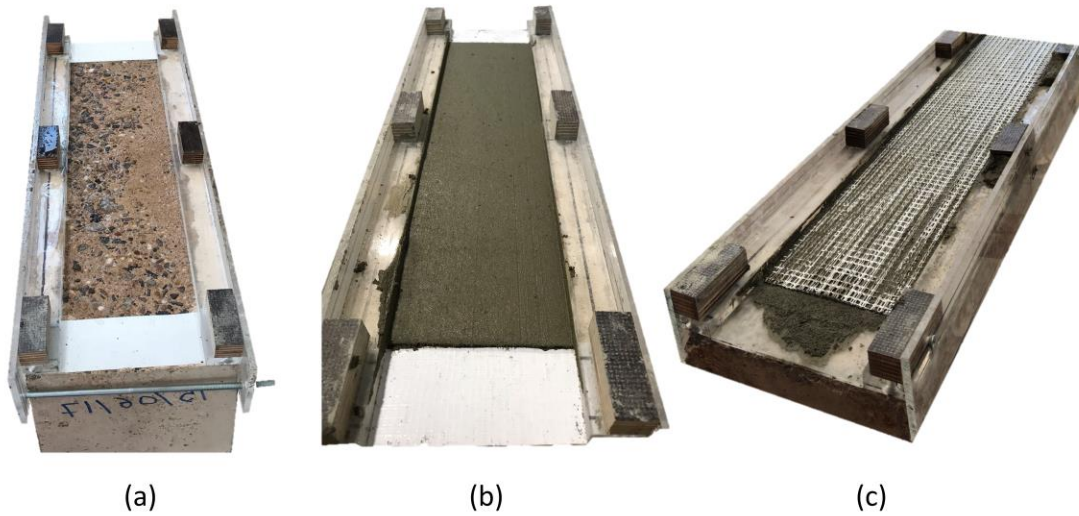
Steps of the manufacturing process of specimens for shear bond tests: (a) grinded surface prior to the application of the first layer of grout, (b) application of the first layer of grout, and (c) first layer of steel textile placed on top of the grout layer.
